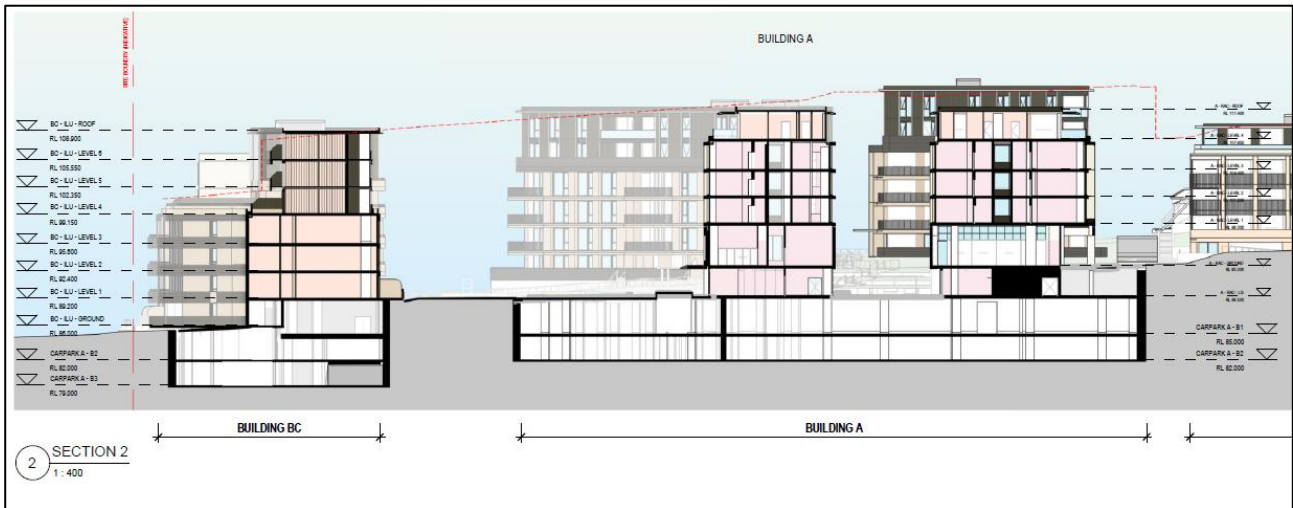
Excerpt of architectural drawings showing stepped basement profile
